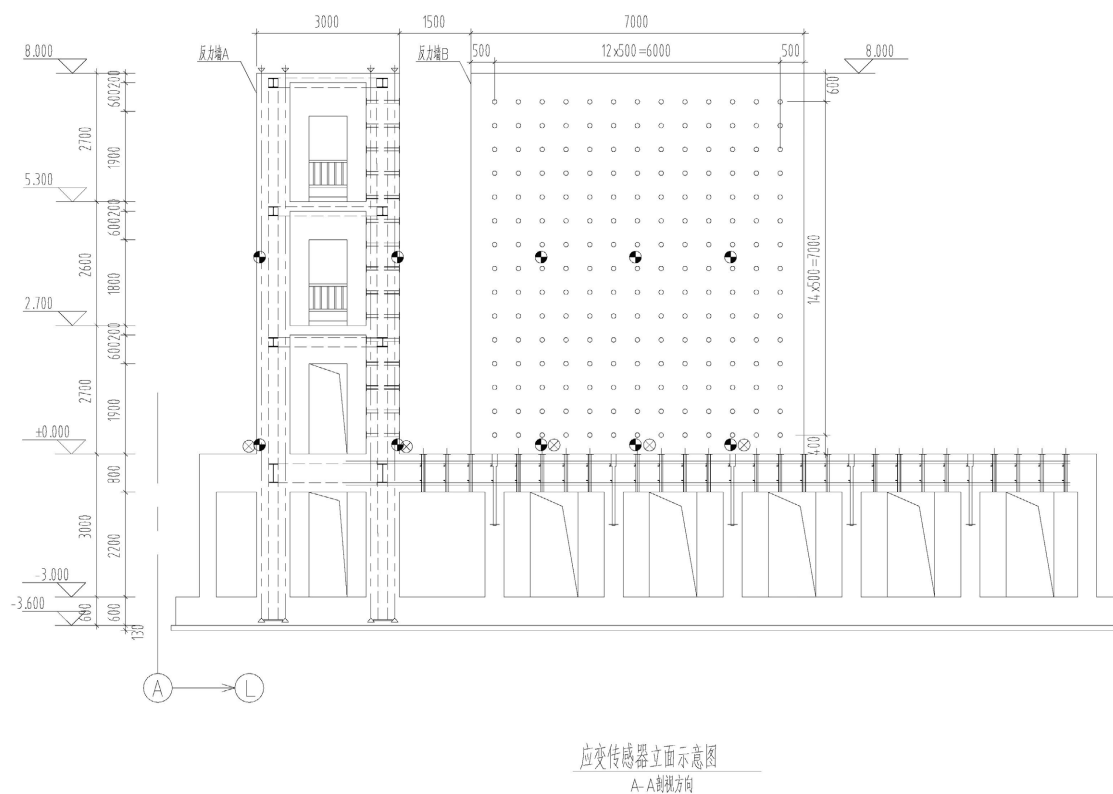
Schematic elevation diagram of strain sensors (Section A-A)
